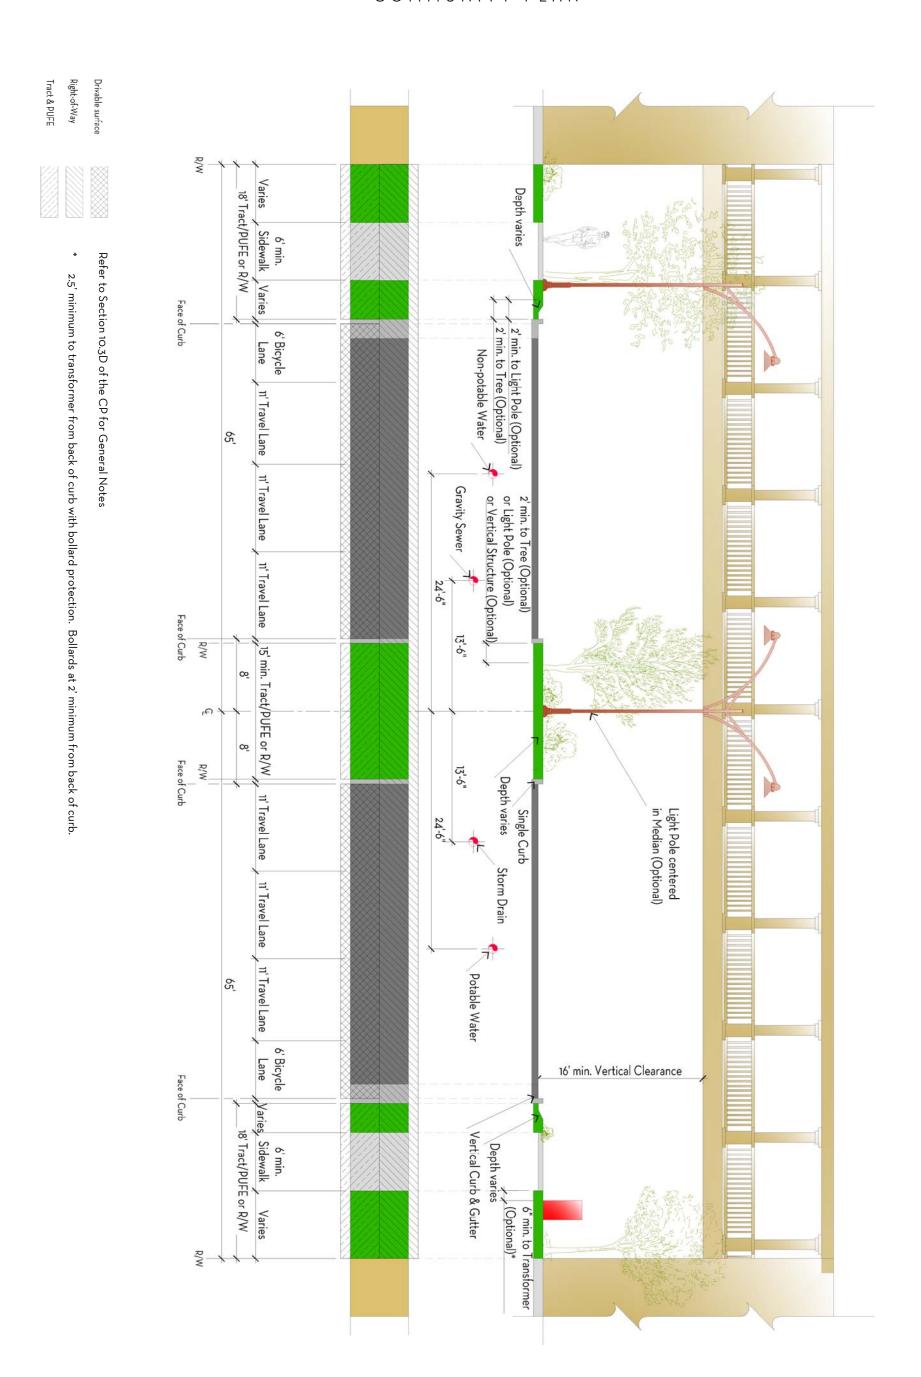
6 Lane Perimeter Arterial/6 Lane Internal Arterial (Ray Road) - Detailed Cross Section
